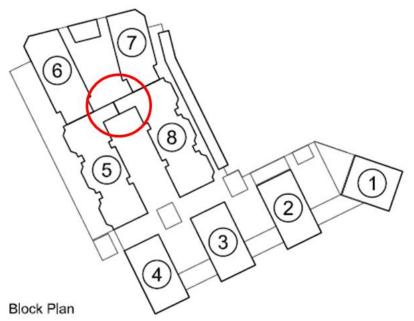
Awkward layout between Blocks 6 and 7 and blocks to south
